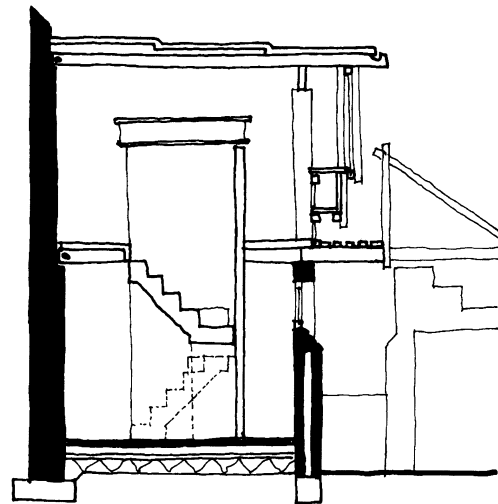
Edward Cullinan, House, London, 1963. Section. From Edward Cullinan Architects, RIBA, p. 19.
